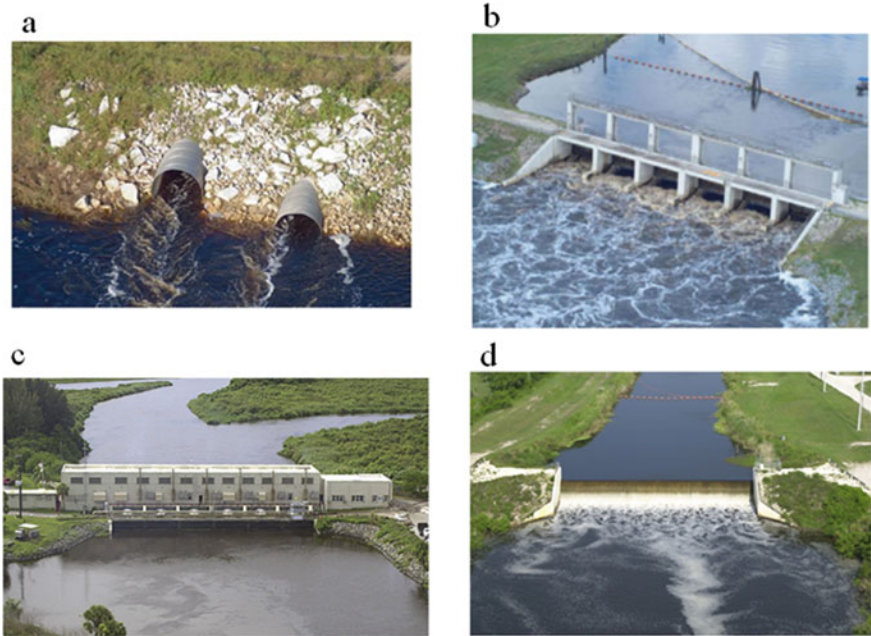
Water control structures a culvert, b spillway, c pump station, and d weir
